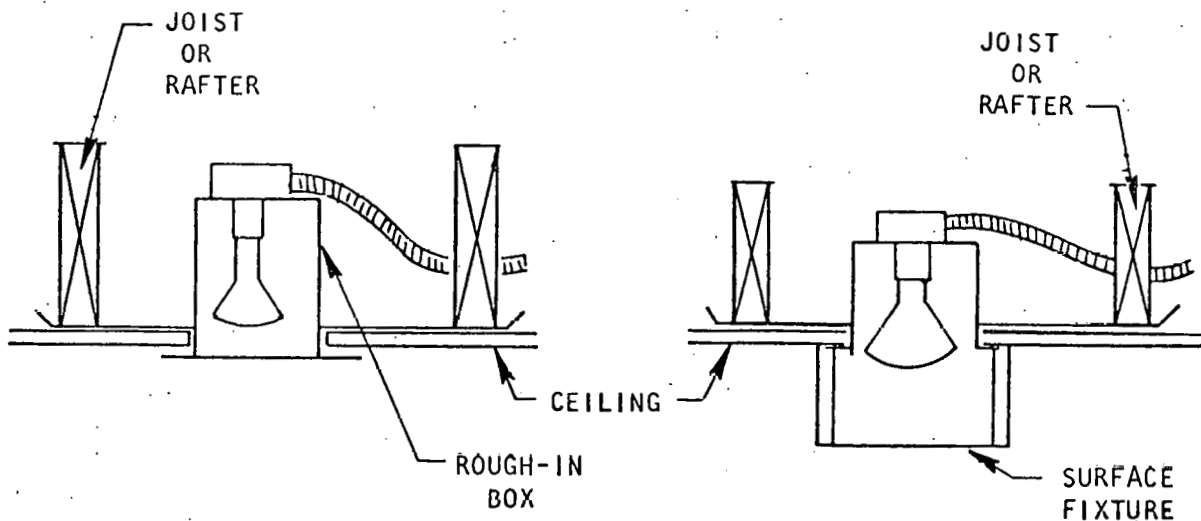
Recessed and Semi-recessed Lighting Fixtures
